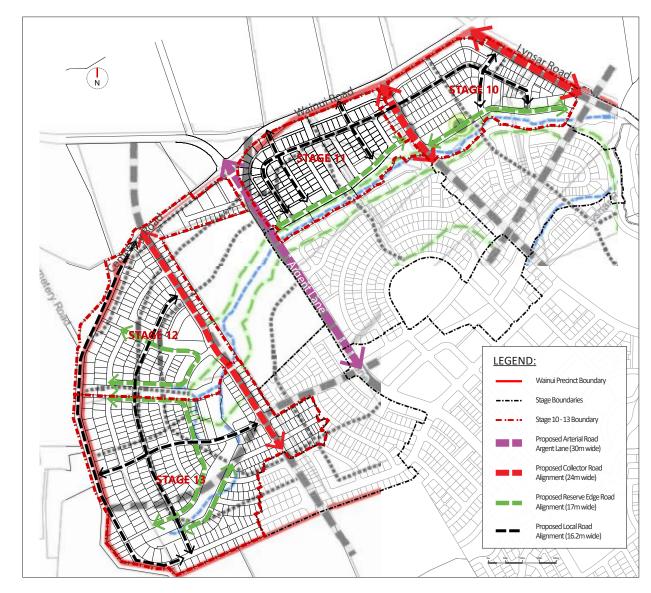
WAINUI PRECINCT PLAN - MOVEMENT FRAMEWORK / SCHEME PLAN OVERLAY
